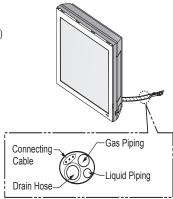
Example of Bundling Gallery Indoor Unit Piping, Drain Hose, and Connecting Cable.
